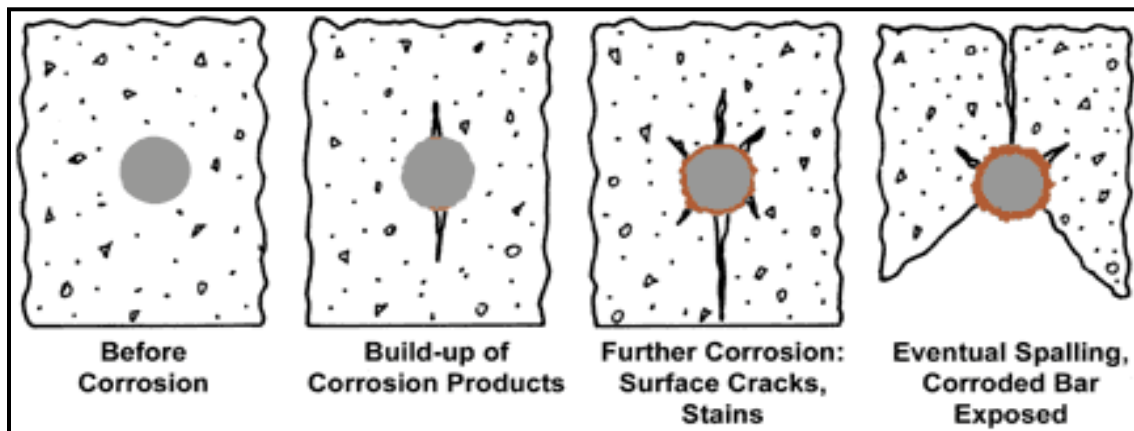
Process of Steel Corrosion-Related Concrete Damage
